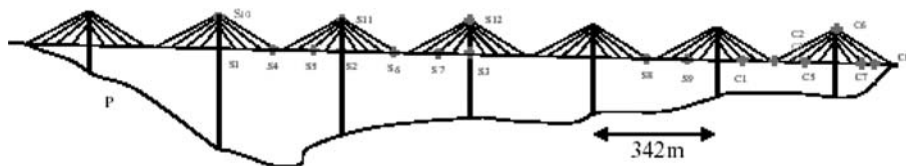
Location of the accelerometers along the bridge, the sensors belonging to the monitoring framework of the bridge are denoted "S", the additional sensors denoted "C".
